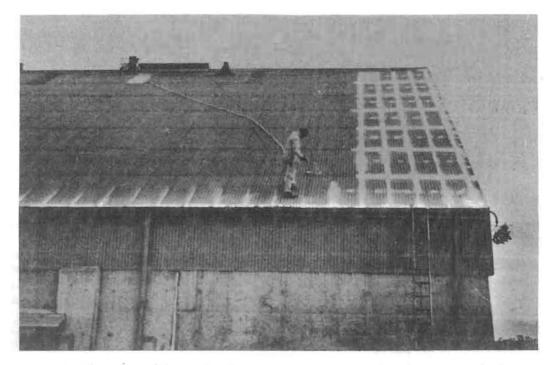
Spray sealing of all lap ends of corrugated iron roof sheets on horizontal silo at Meckering.
